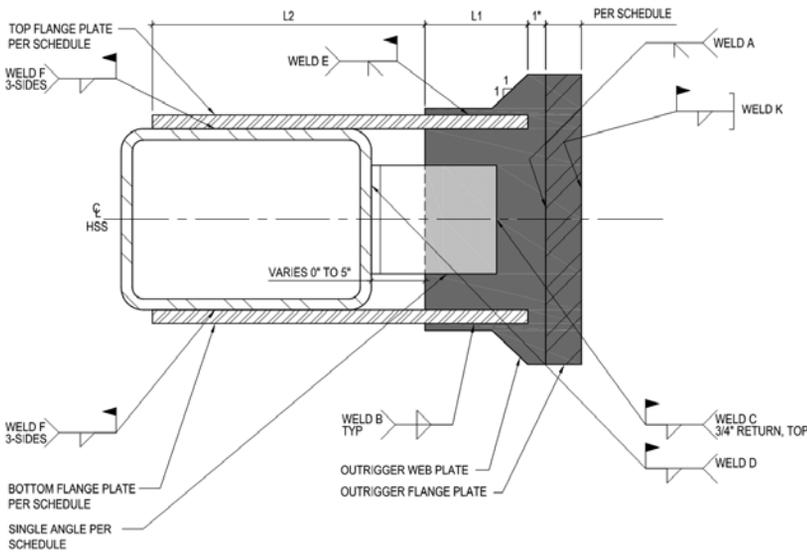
Typical outrigger connection to existing concrete encased steel column. Courtesy of Thornton Tomasetti.
